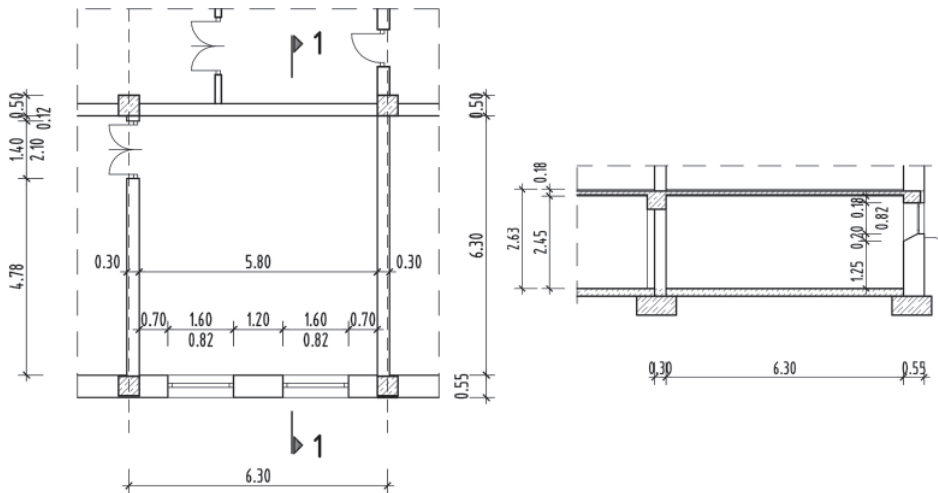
Researched basement, used as an office room: vertical and horizontal cross-section
